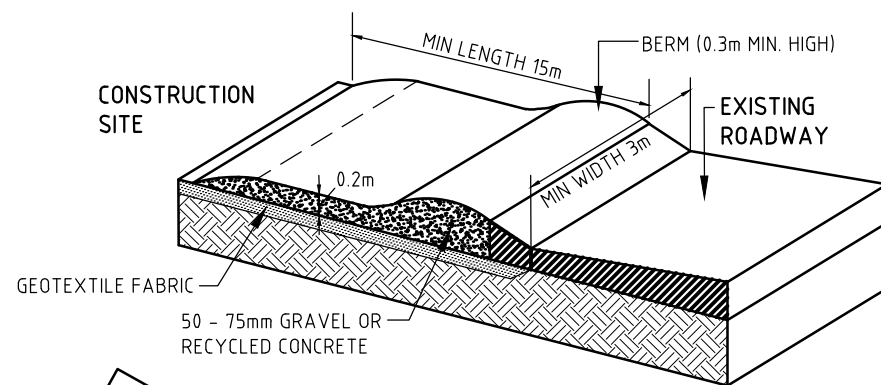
CONSTRUCTION EXIT/ENTRY
